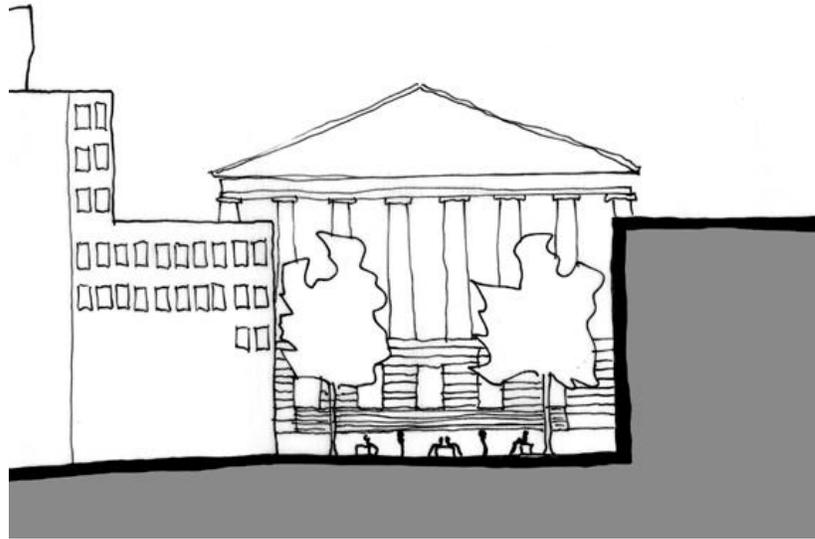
Section through Proposed 8th Street Pedestrian Mall Looking north towards National Portrait Gallery
